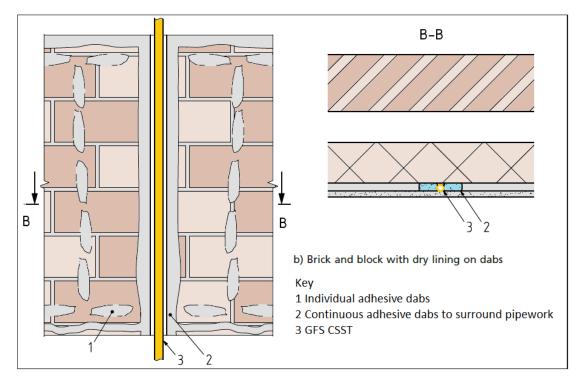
Typical example of pipework installed in brick and block with dry lining dabs
